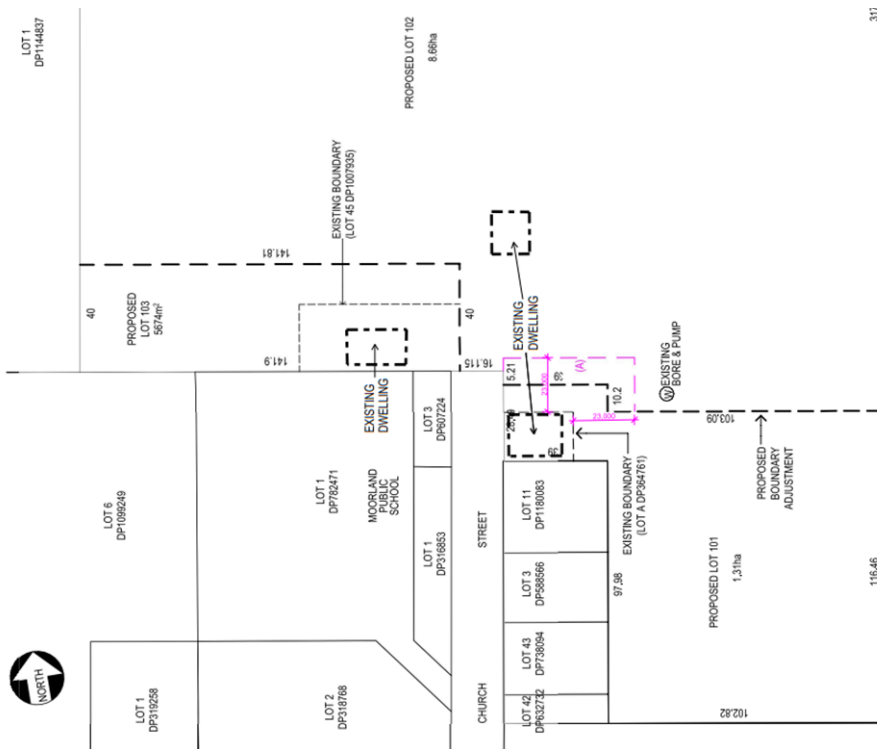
Proposed Subdivision Plan (Source: King & Campbell)
